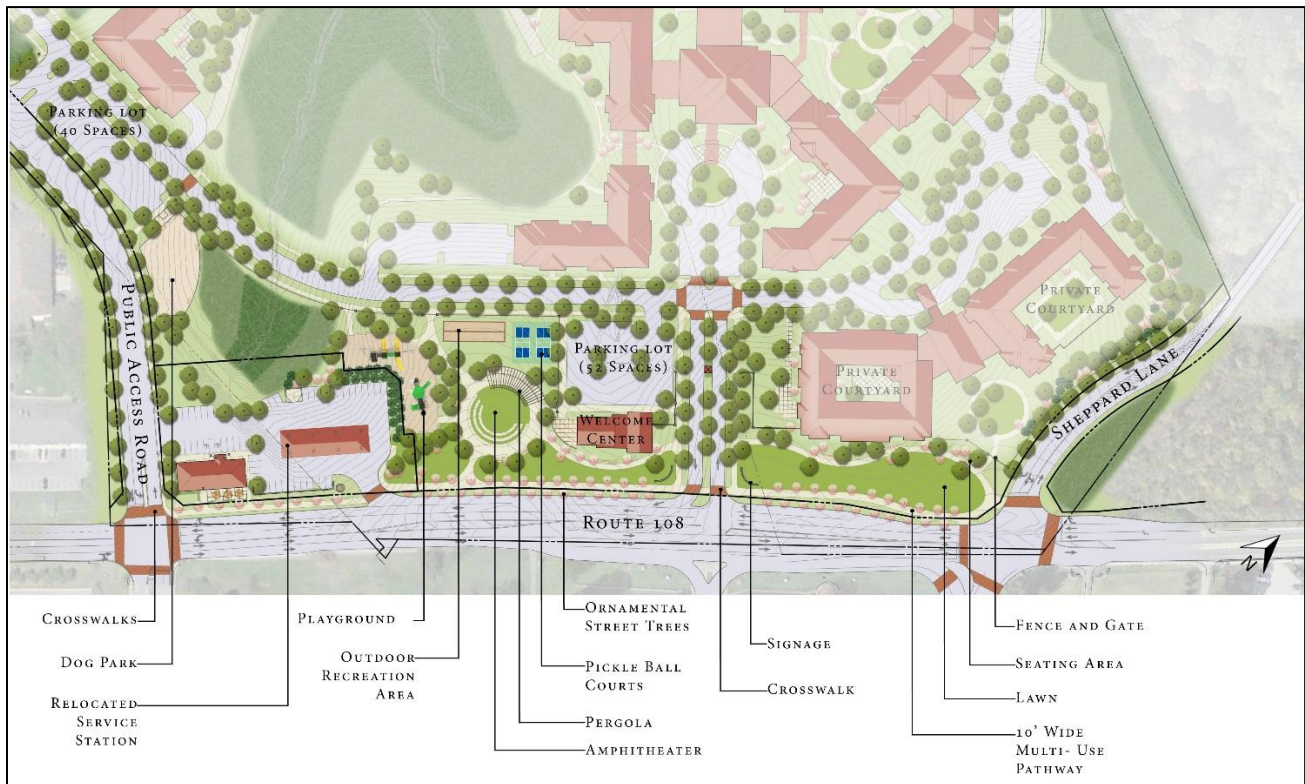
Development Concept Plan Supplement: Illustrative Site Plan, Clarksville Pike Frontage
